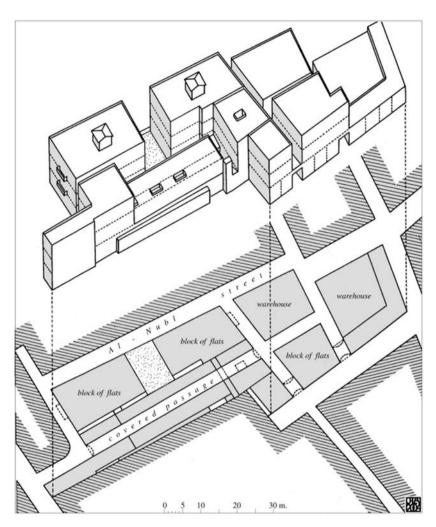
Cairo, covered passageway, Franc quarter. This assemblage, built around 1890, comprises five blocks, a warehouse, workshops, and some thirty shops. Author's restitution and drawing, after E. Goad, Insurance plan of Cairo—Egypt—March 1905 (London, Toronto, 1905).
